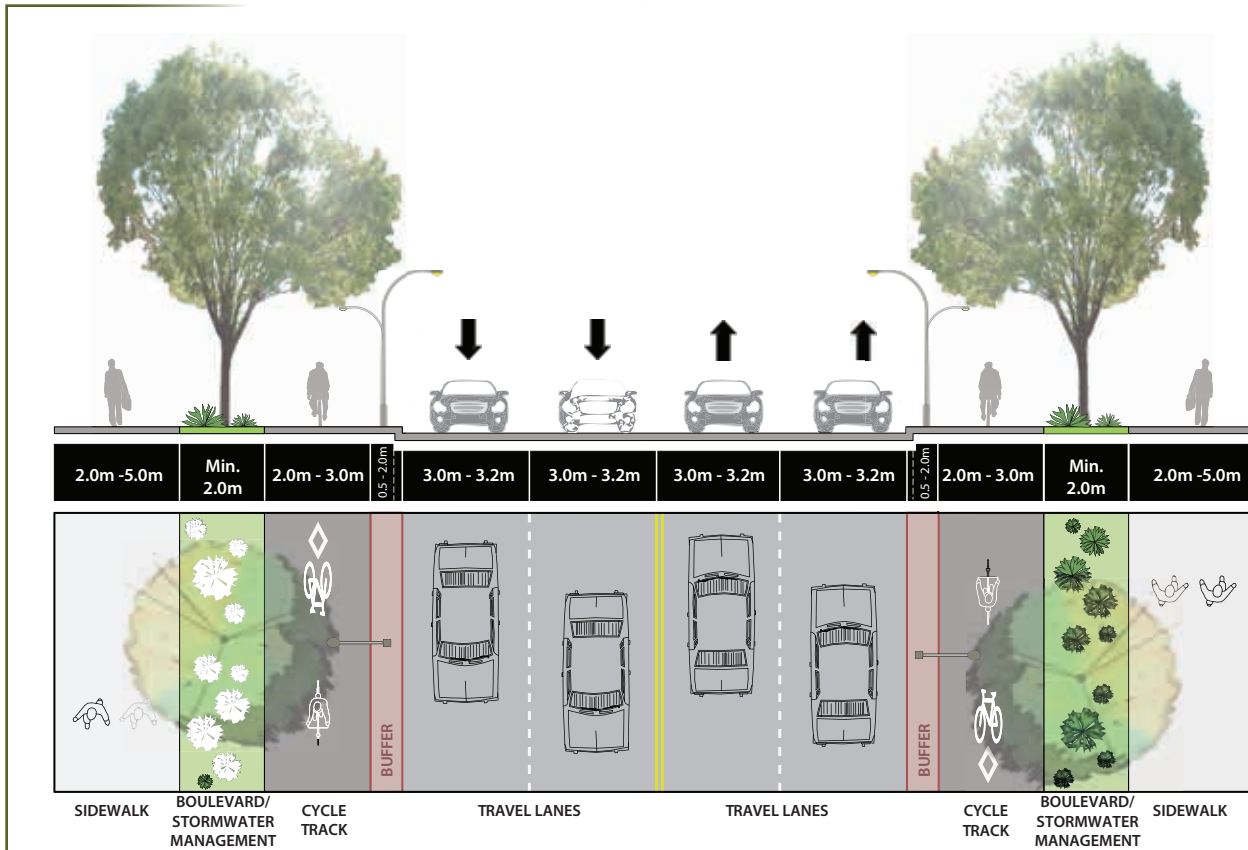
| Mid-term Shelbourne Street Cross-Section
